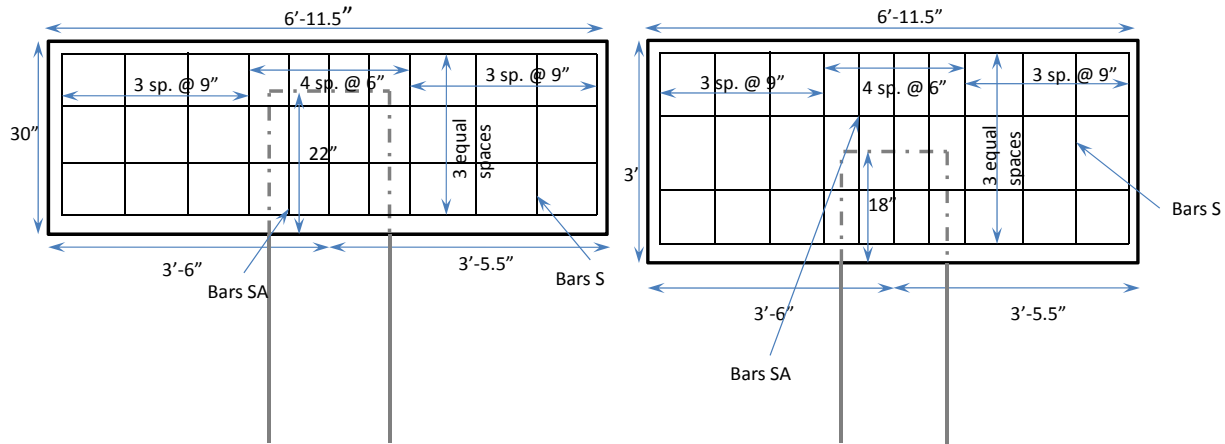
Bent Cap Reinforcement - Interior Specimens
